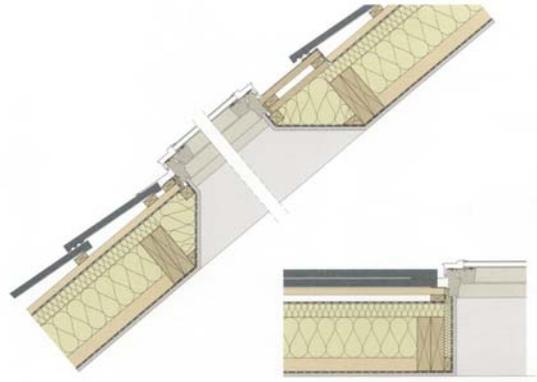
Robust Detail 8.03 – Rooflight detail (ventilated batten void).
